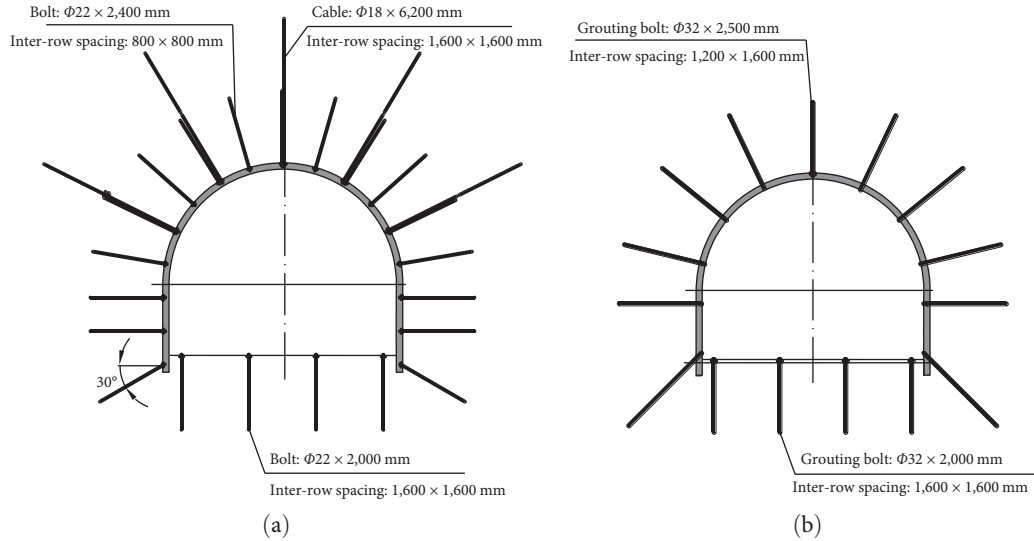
Proposed support schemes. (a) Bolt and cable support scheme and (b) grouting scheme.
